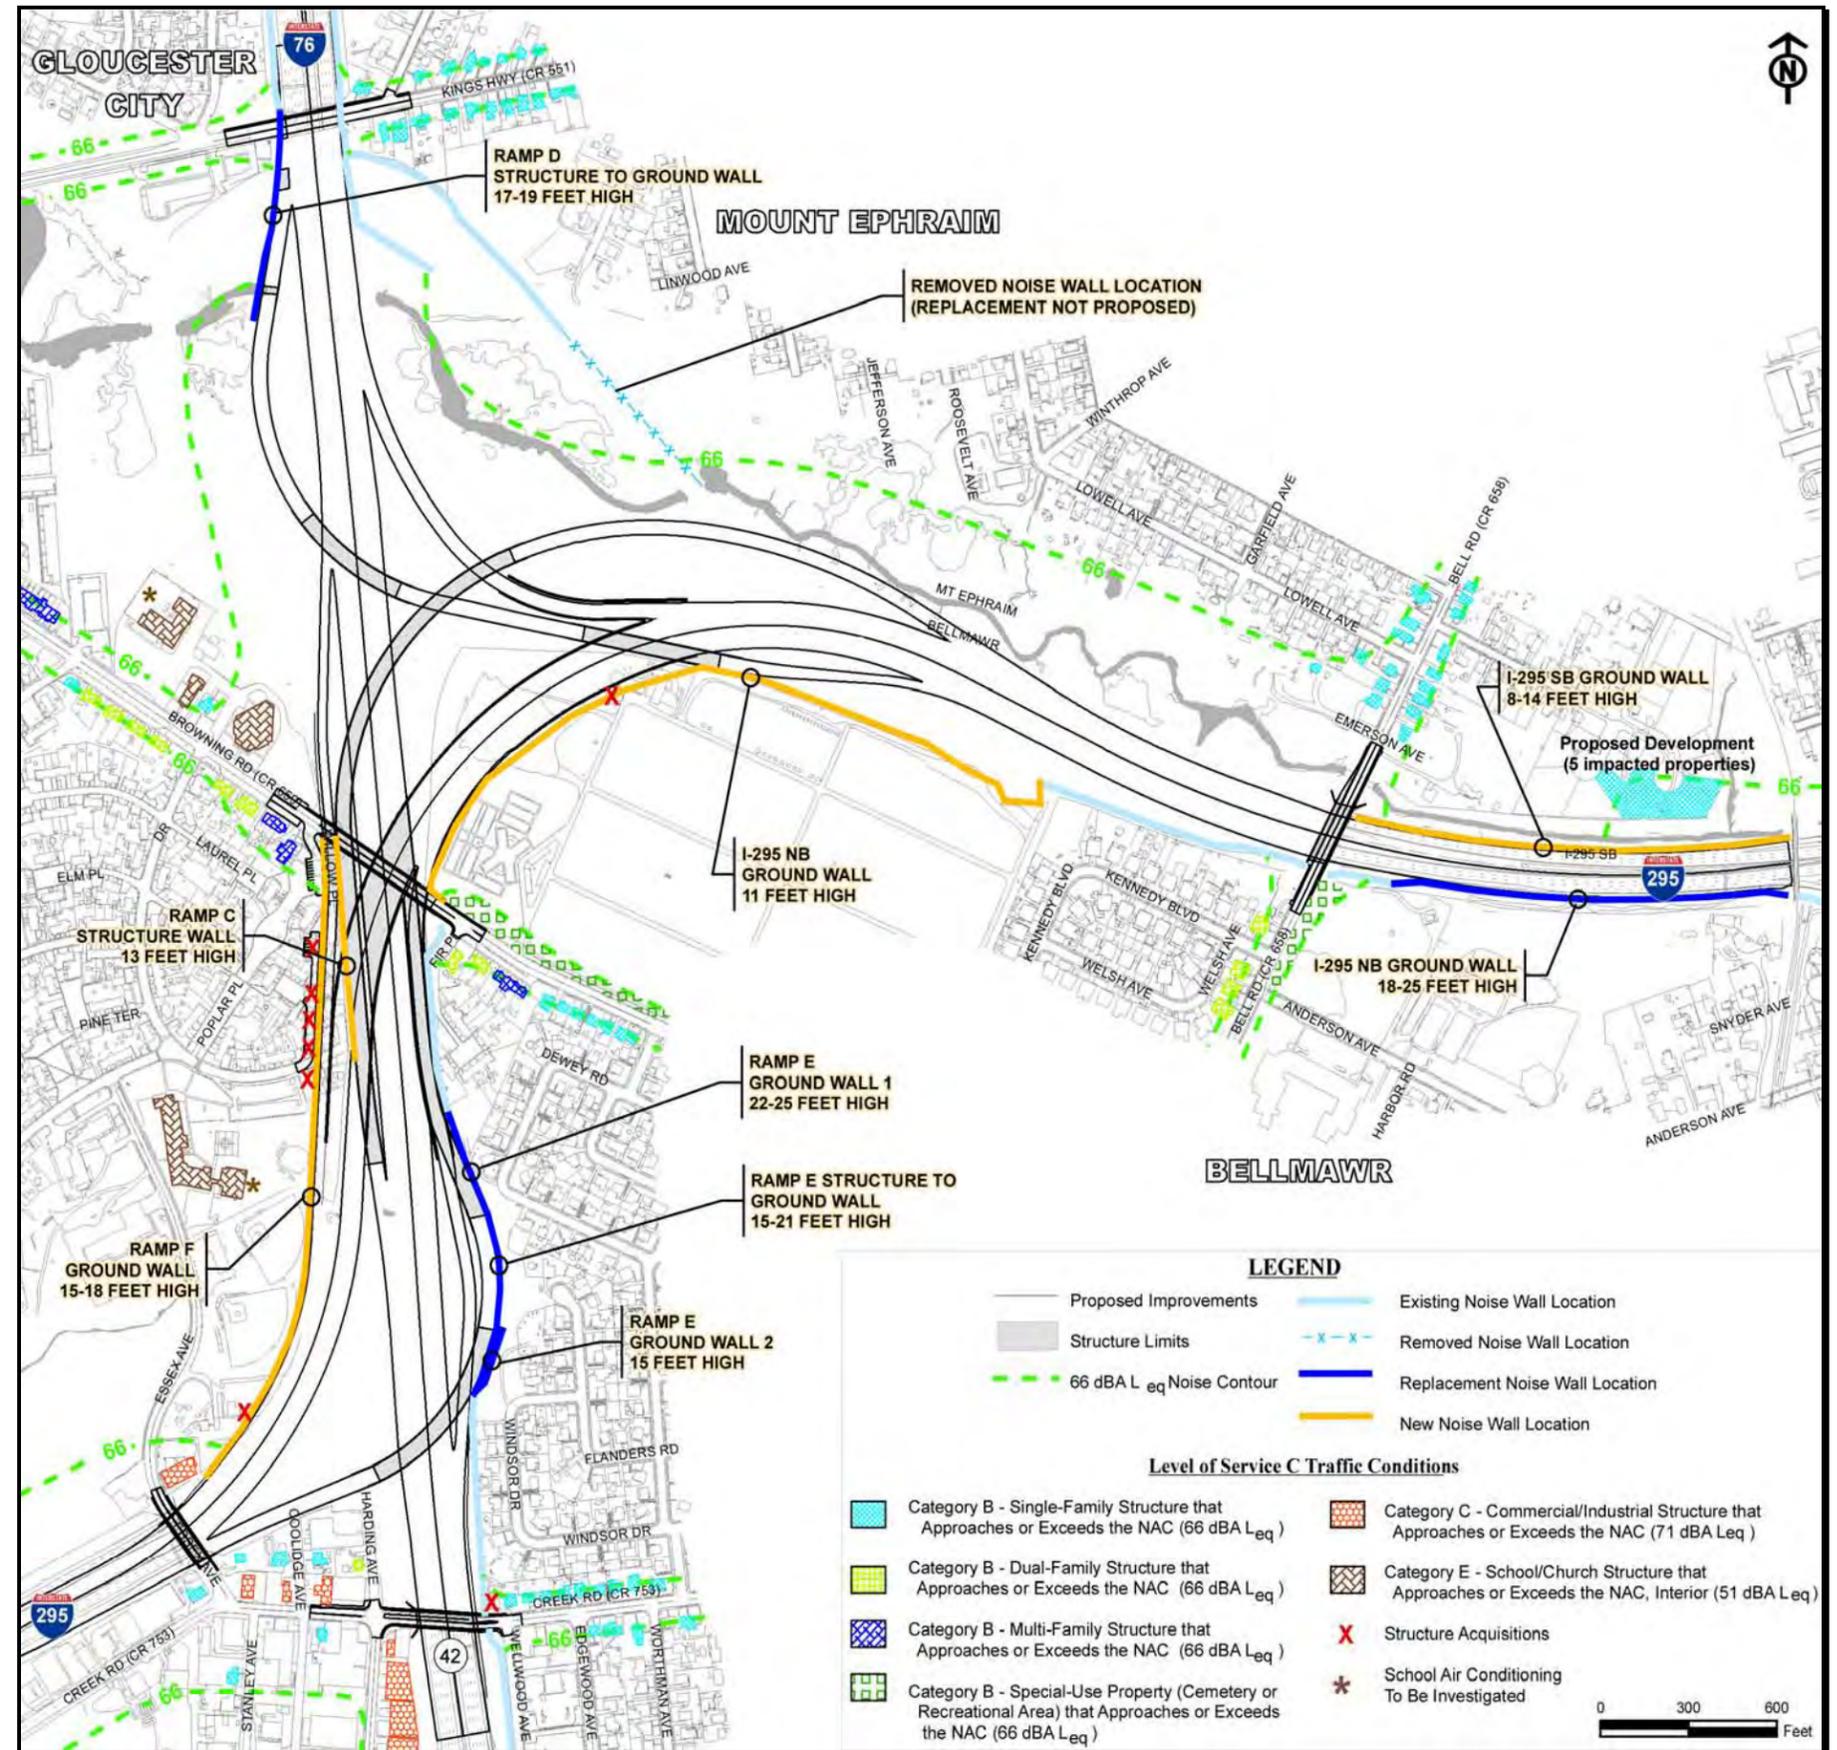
2030 Alternative K Proposed Noise Walls
